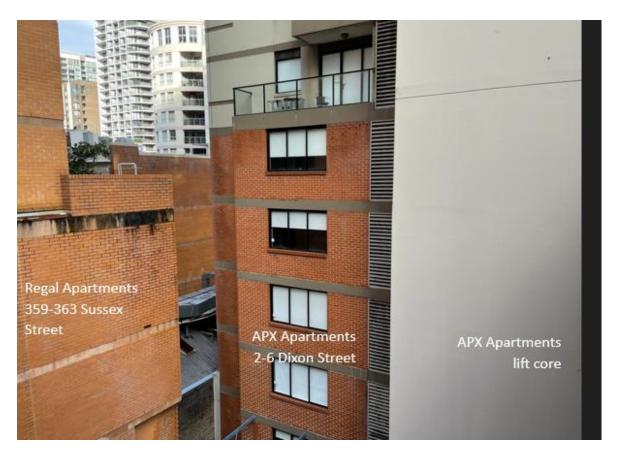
Existing rear interface with the APX Apartments viewed from the subject site facing southwest
